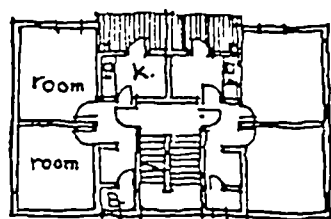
The plan of Samir's housing unit. The extension consists of a separate housing unit built on the roof, identical in plan to the initial provision. A flight of stairs has to be constructed to give access to the roof. The flat on the roof is occupied by Samir's married sister and her family. The sister's husband financed the construction. Samir still has the opportunity to extend his fourth floor flat horizontally as the neighbours beneath have already extended providing him with the base to build on. He is planning to extend in the next year.
